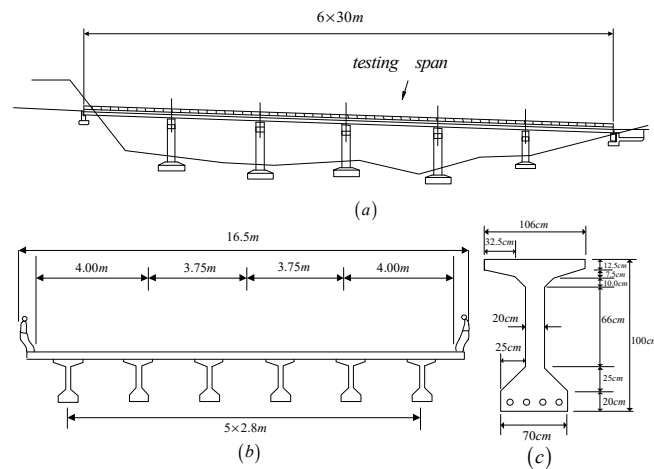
Bridge for simulation: (a) Elevation; (b) Cross-section; (c) Girder cross-section.
